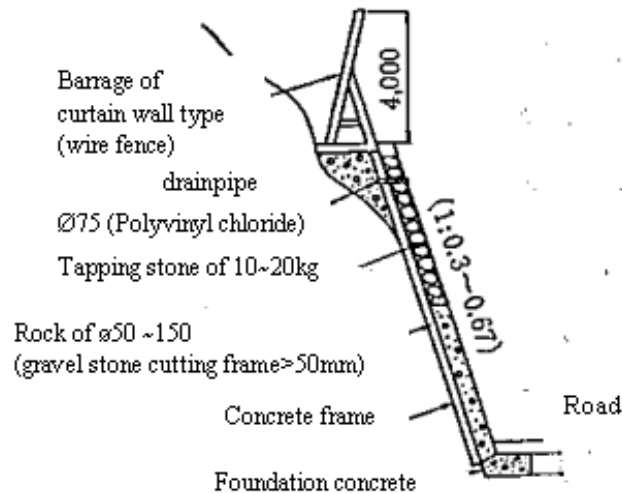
Example of the recovery method using cast in-situ concrete frame
